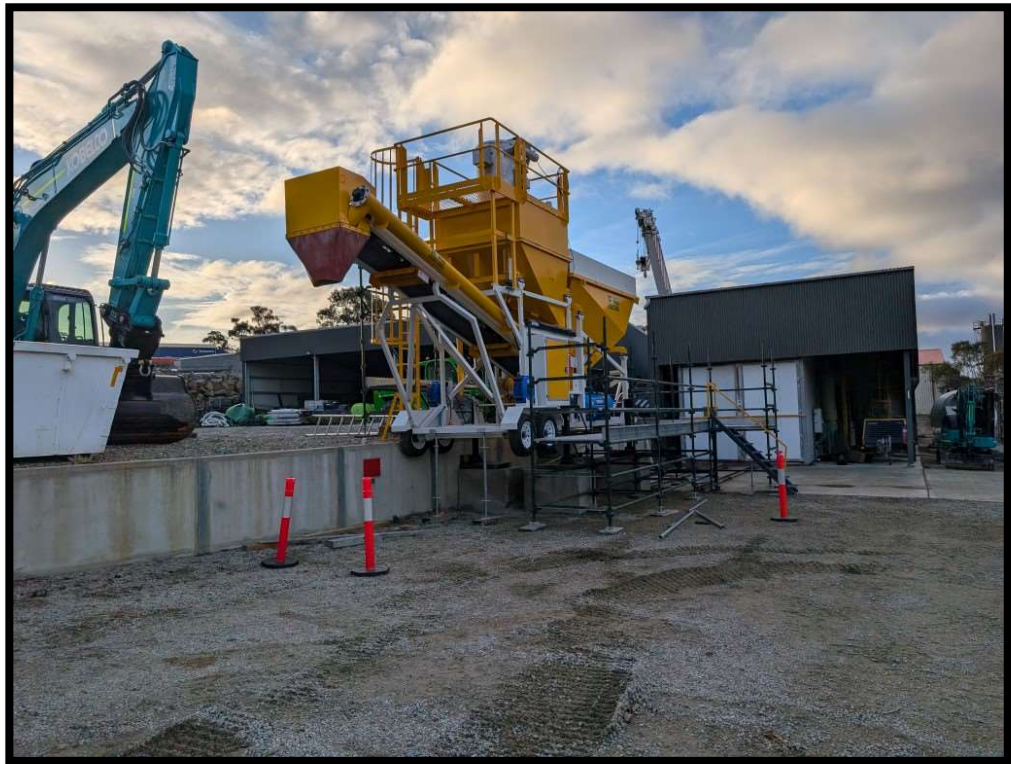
Proposed mobile plant installed at the Doppelmayr Jindabyne site
